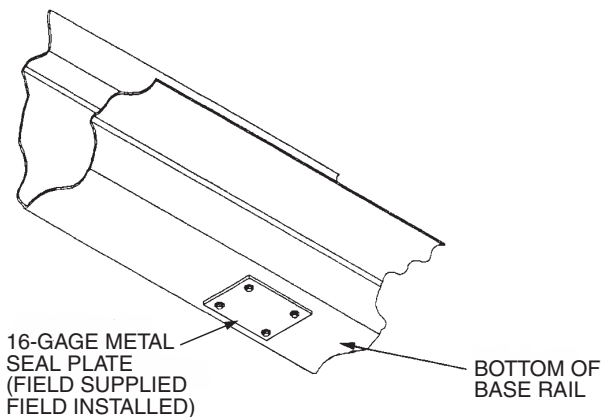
Secondary Drain Seal Plate Location (Slab Mount)
